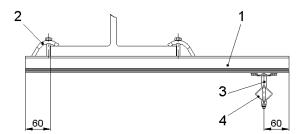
Rail installation using cross arms on the upper or lower side of an I-beam
